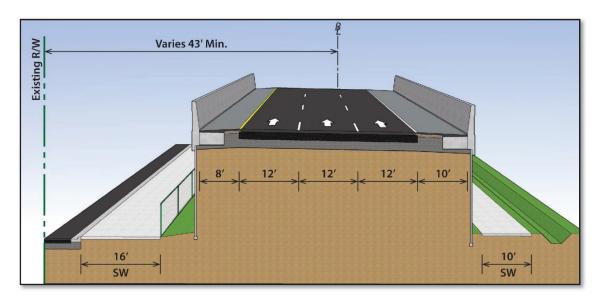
Proposed Typical Section – Florida Avenue Loop Ramp (On MSE wall)
